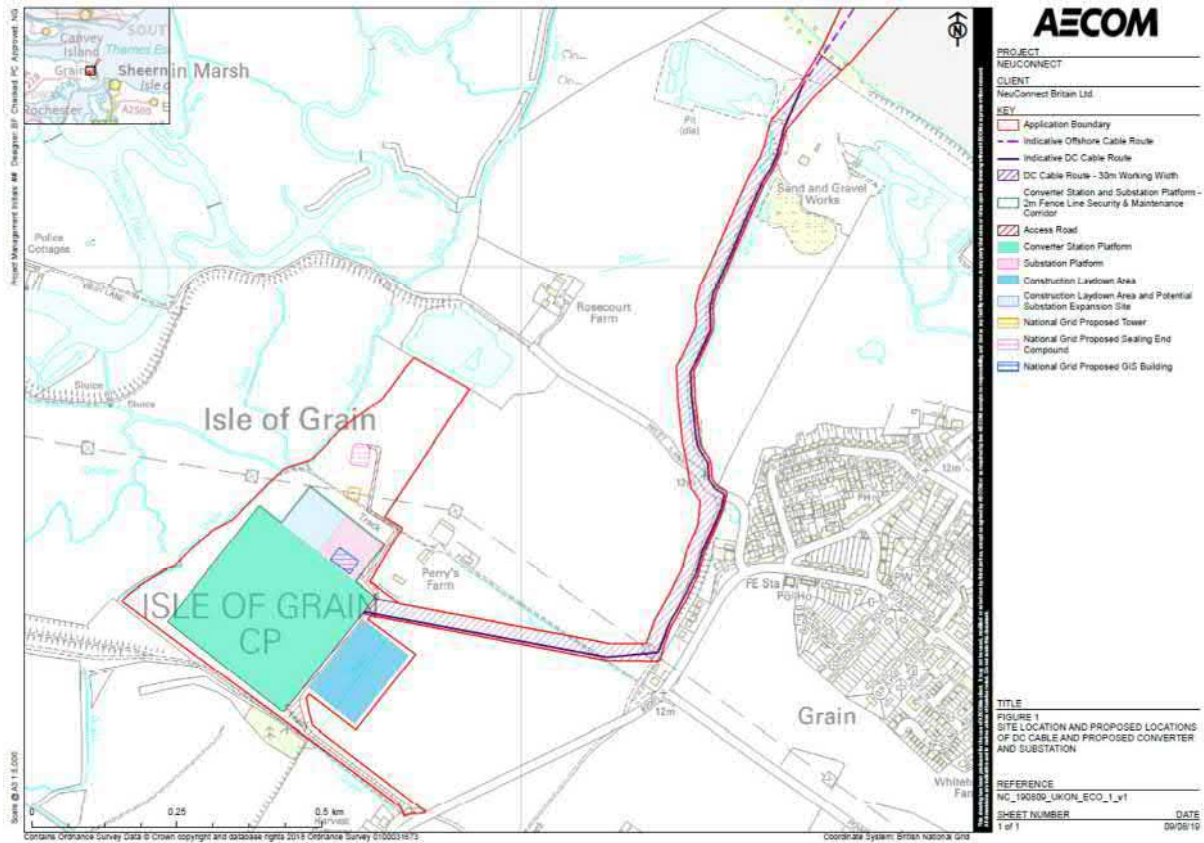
Site boundary and proposed locations of DC cable route, converter station and substation
